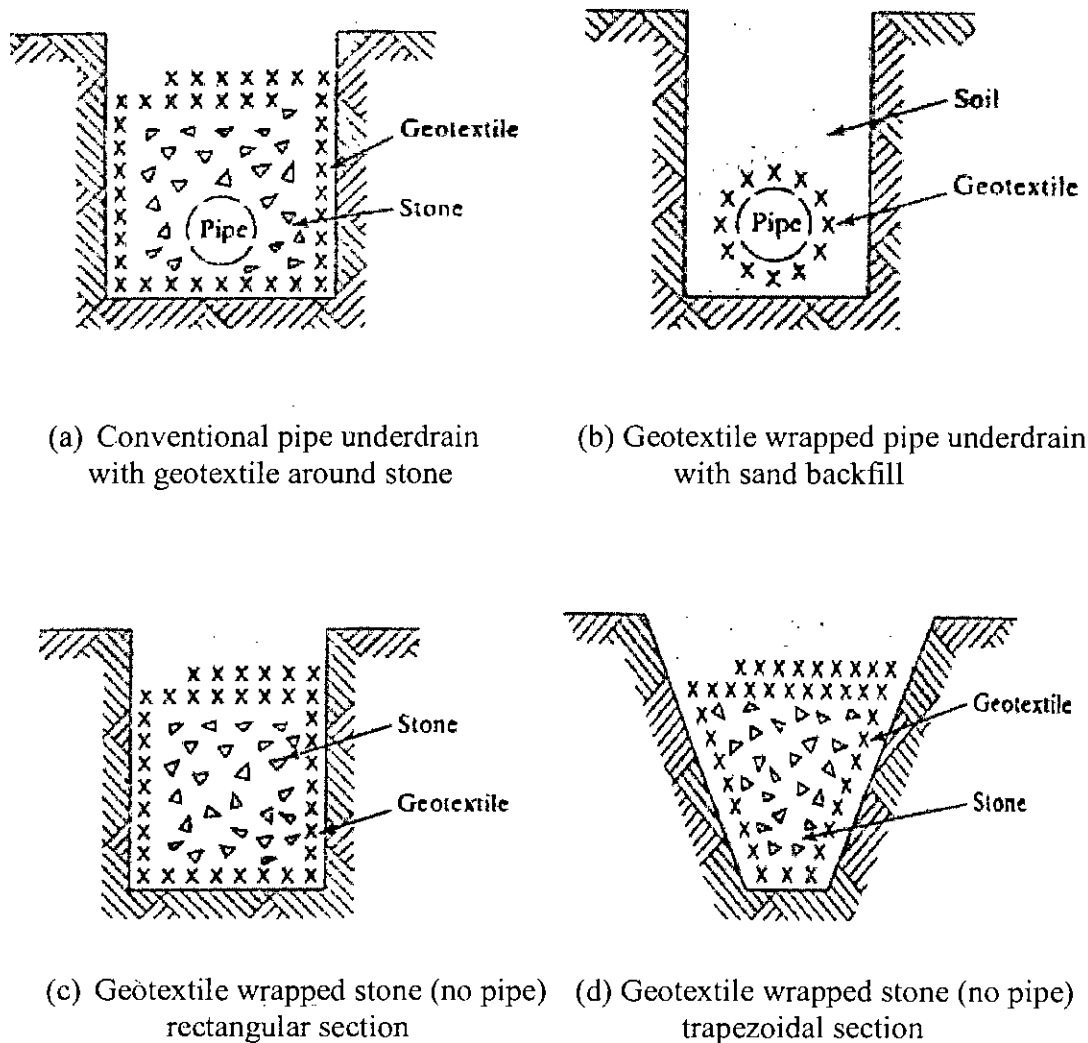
Typical cross sections of underdrain systems with and without perforated pipes (after Koerner, 1997)
